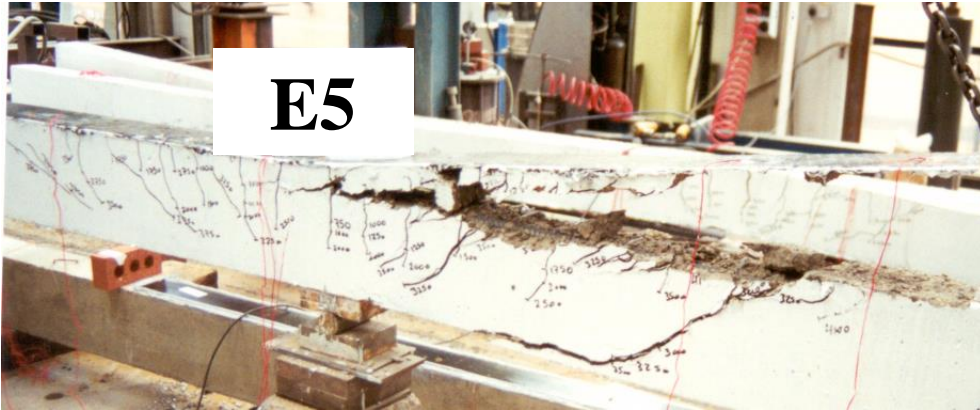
Peeling failure of CFRP sheets over the central support of beam E5
